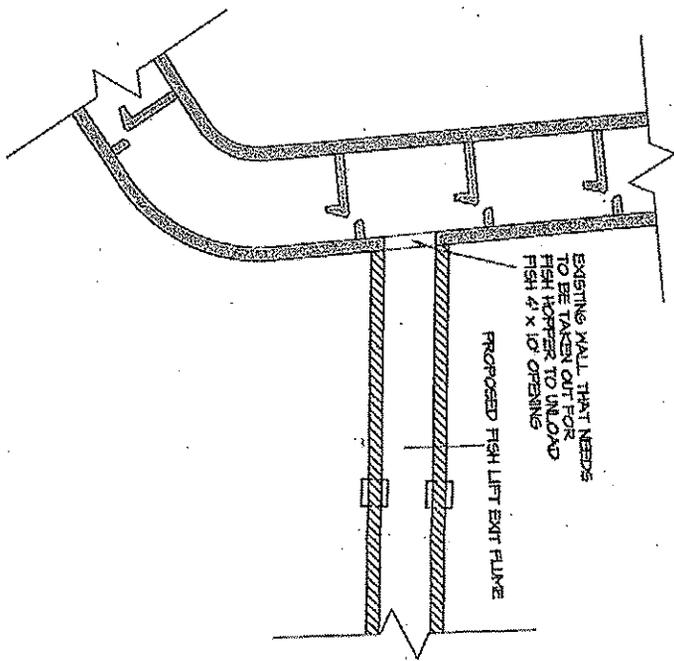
& EXT RISE SECTION		State of Connecticut DEPARTMENT OF PUBLIC WORKS
